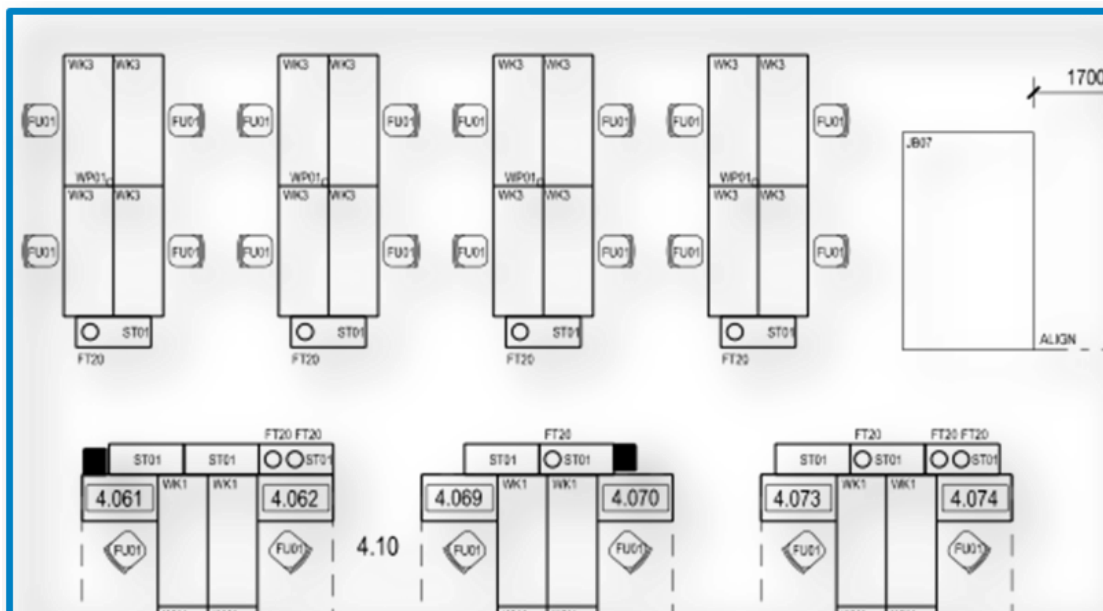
Plan of the hot desk area and layout table that was installed at the SMO.
